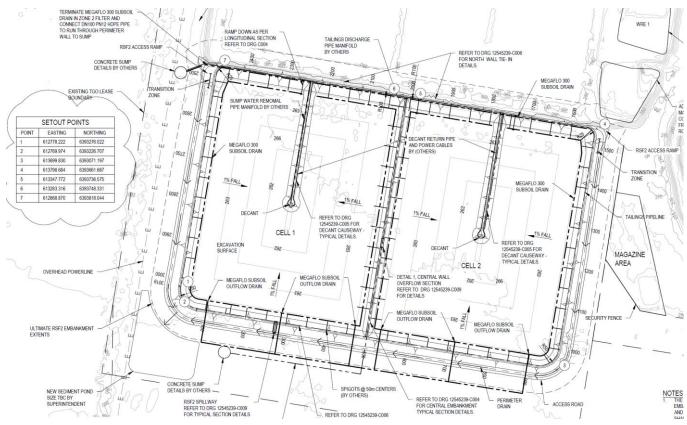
Preferred Site Arrangement – Stage 1 Extent Plan
